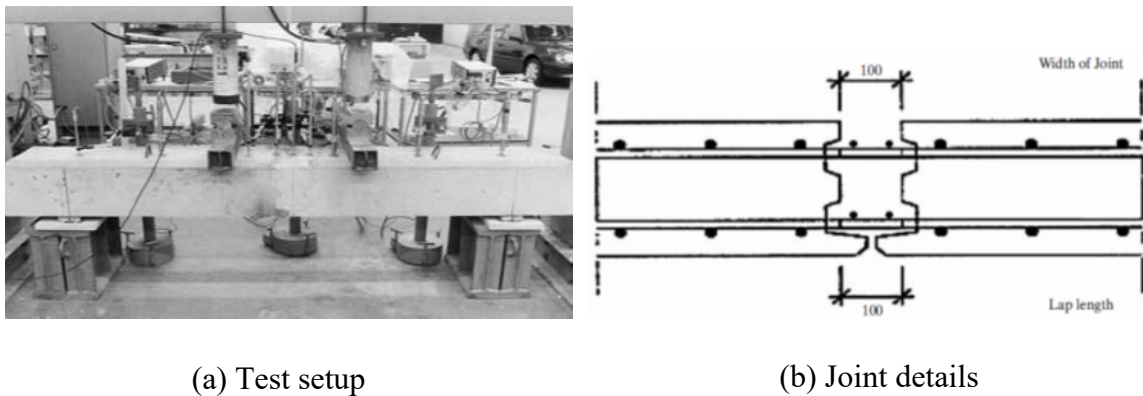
The test setup and joint details (Harryson, 2003)
